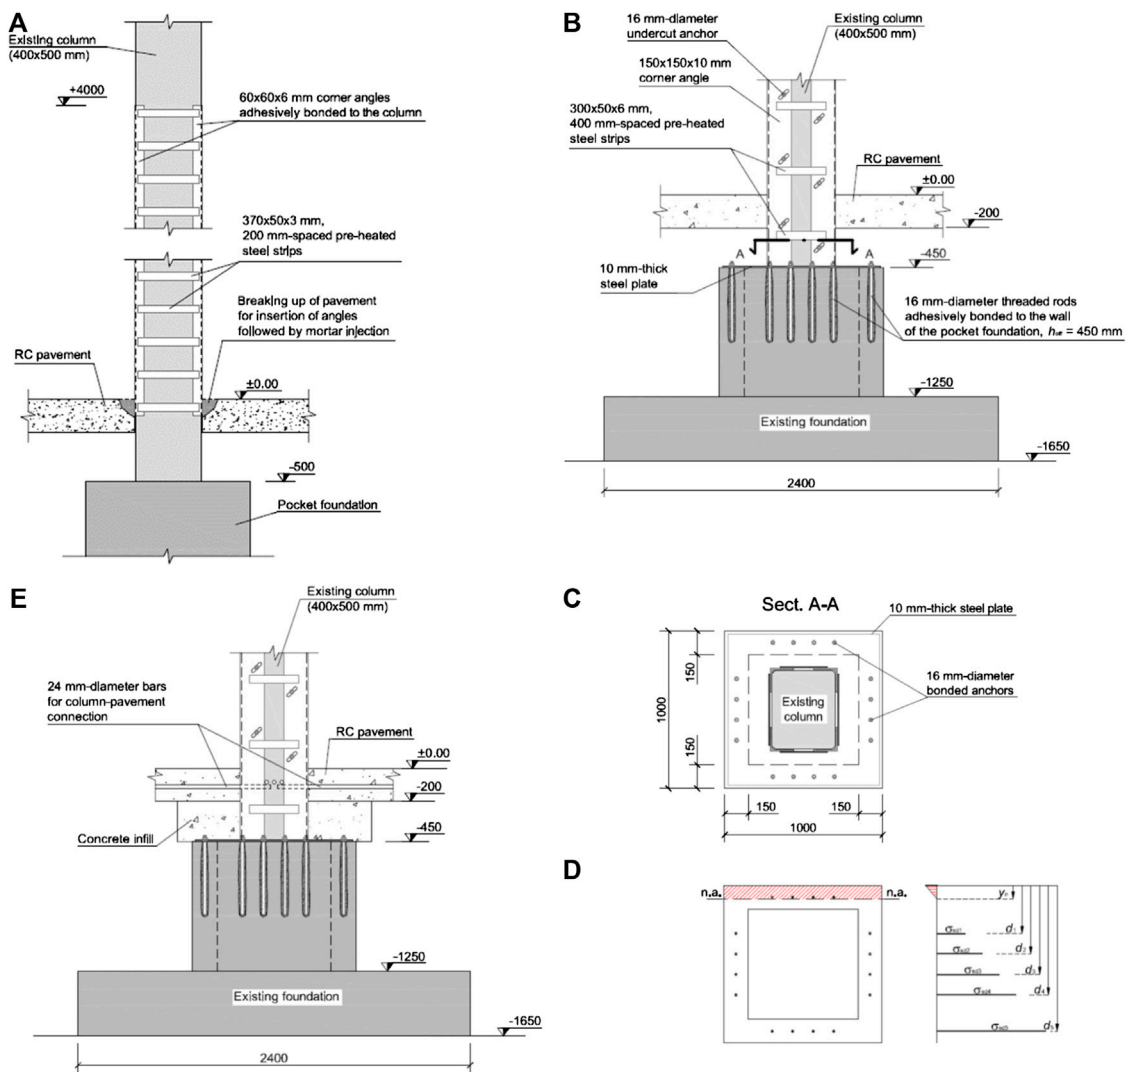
| Steel jackets applied to precast RC columns: (A) corner angles inserted into the pavement but not anchored to the foundation; (B) jacket connected to the pocket walls by means of bonded anchors, (C) corresponding in-plan anchors arrangement and (D) calculation model for bending resistance of the pocket; (E) the same as (B) plus column-to-pavement connection. Dimensions in mm.
